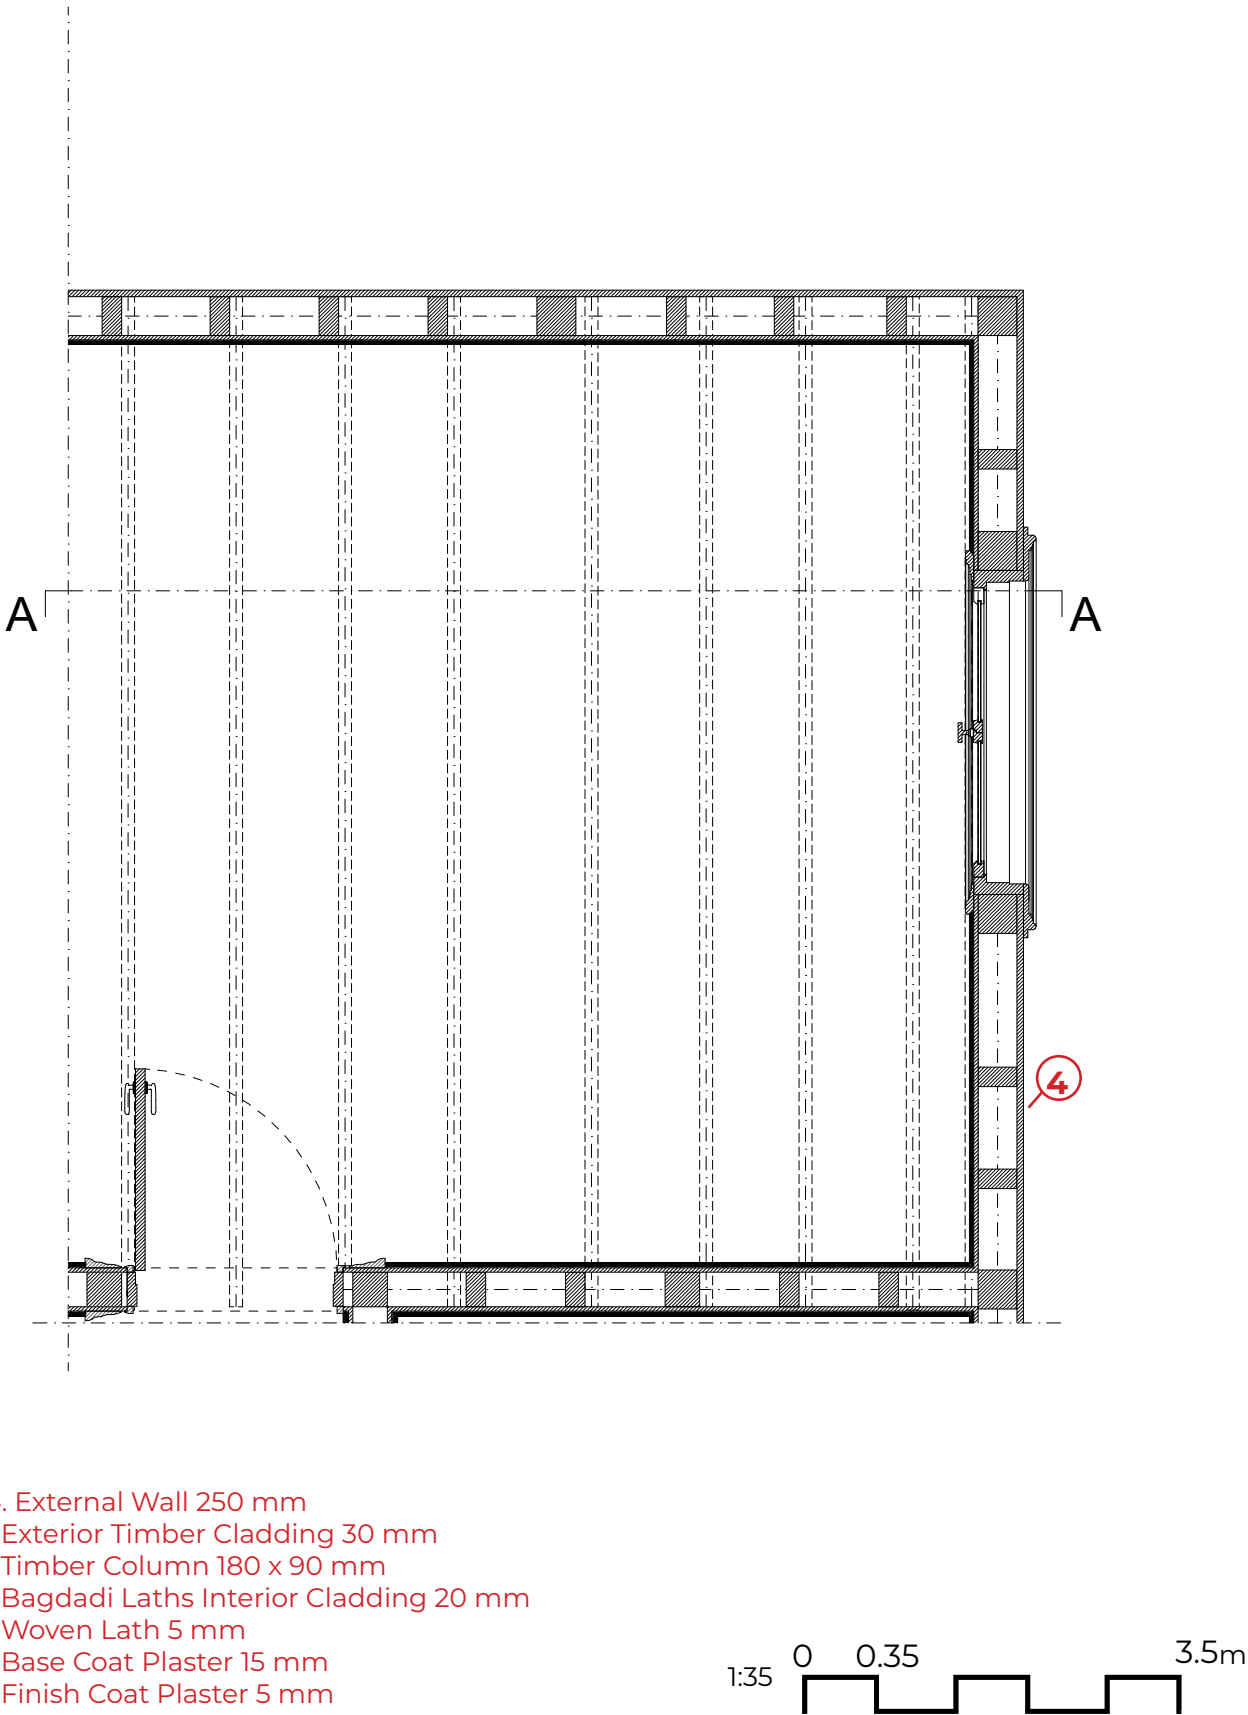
Detail plan of first floor (Source: Created by the author, 2024)
